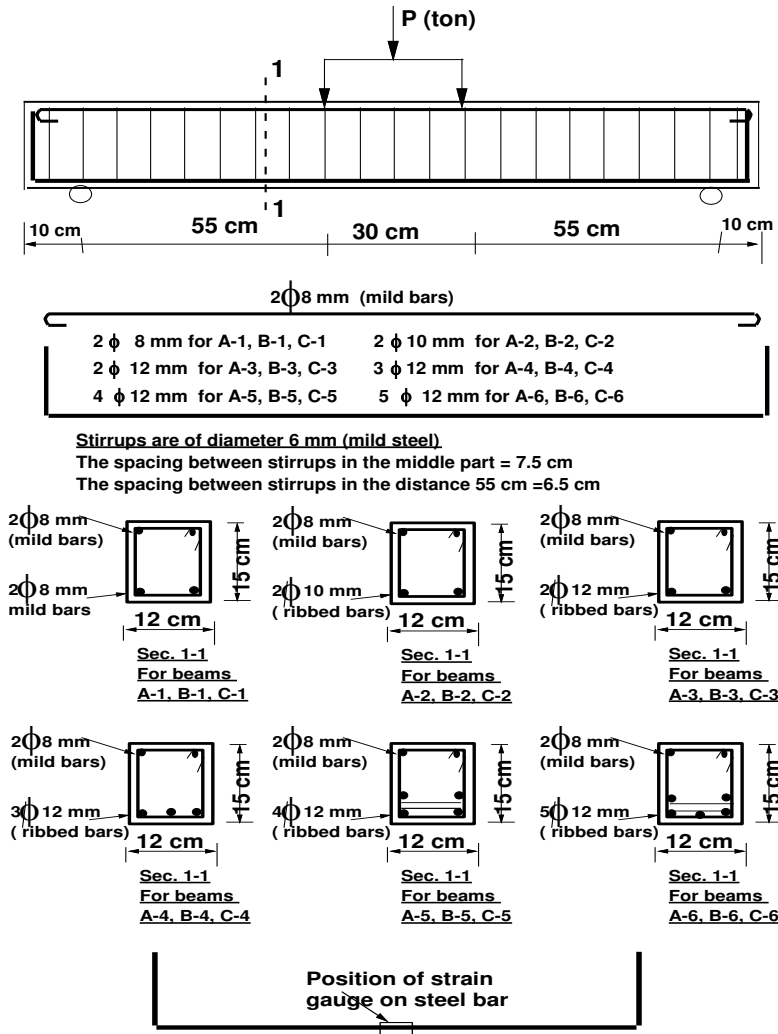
System of loading, details, dimensions and reinforcement of test specimens
